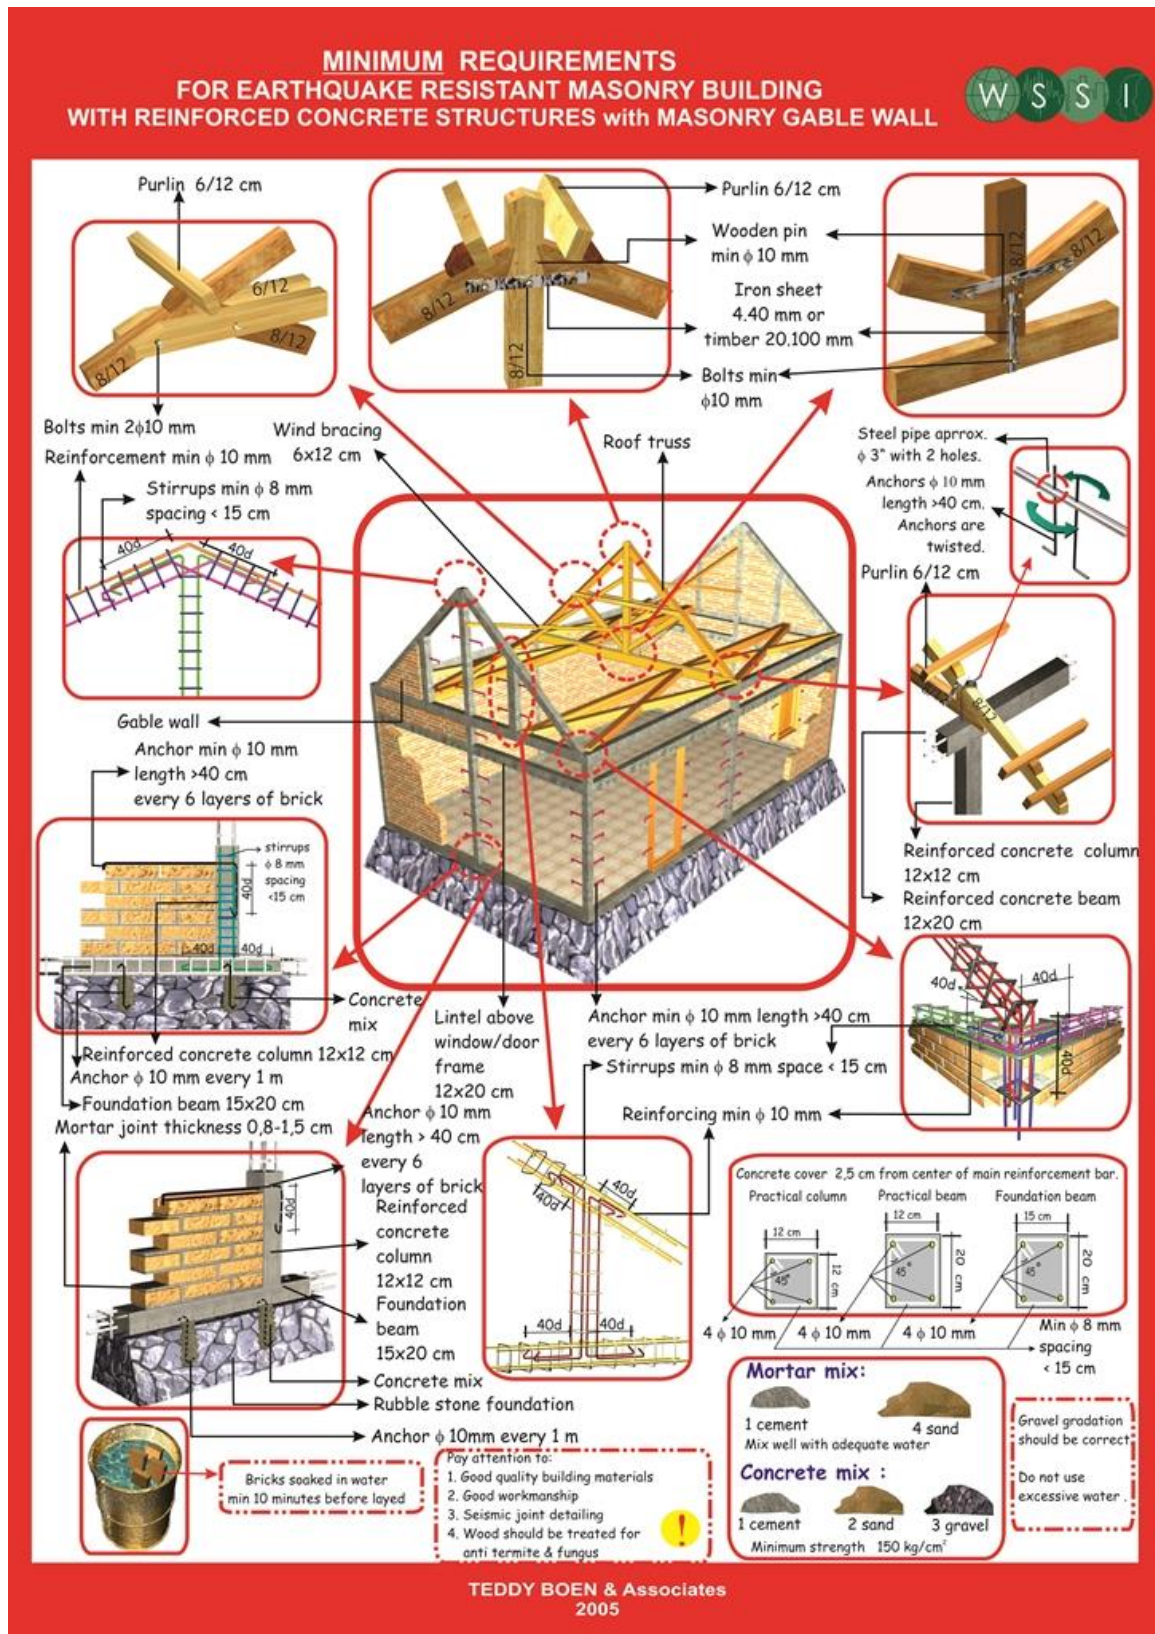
Poster Minimum Requirements for Earthquake Resistant Masonry Buildings with Reinforced Concrete Structures
